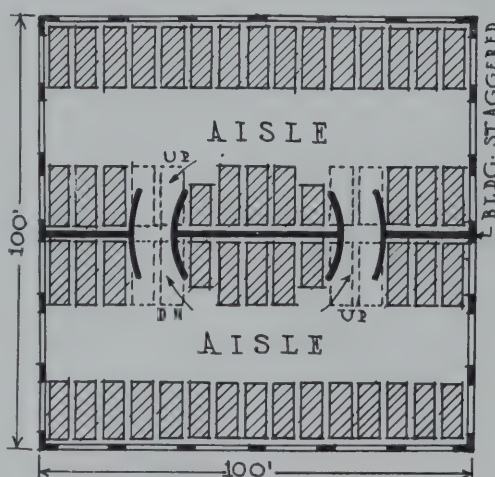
Typical Floor Plan of Garage with Patent Ramp Design and Staggered Floors. Capacity per Floor 52 Cars
